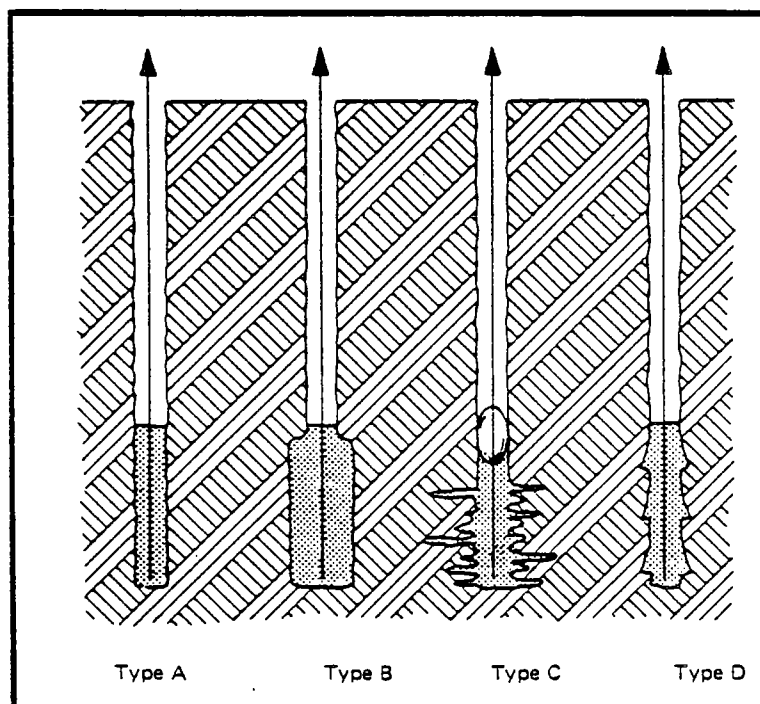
Main types of cement grouted anchorages (B.S.C.P. 8081. 1988)
